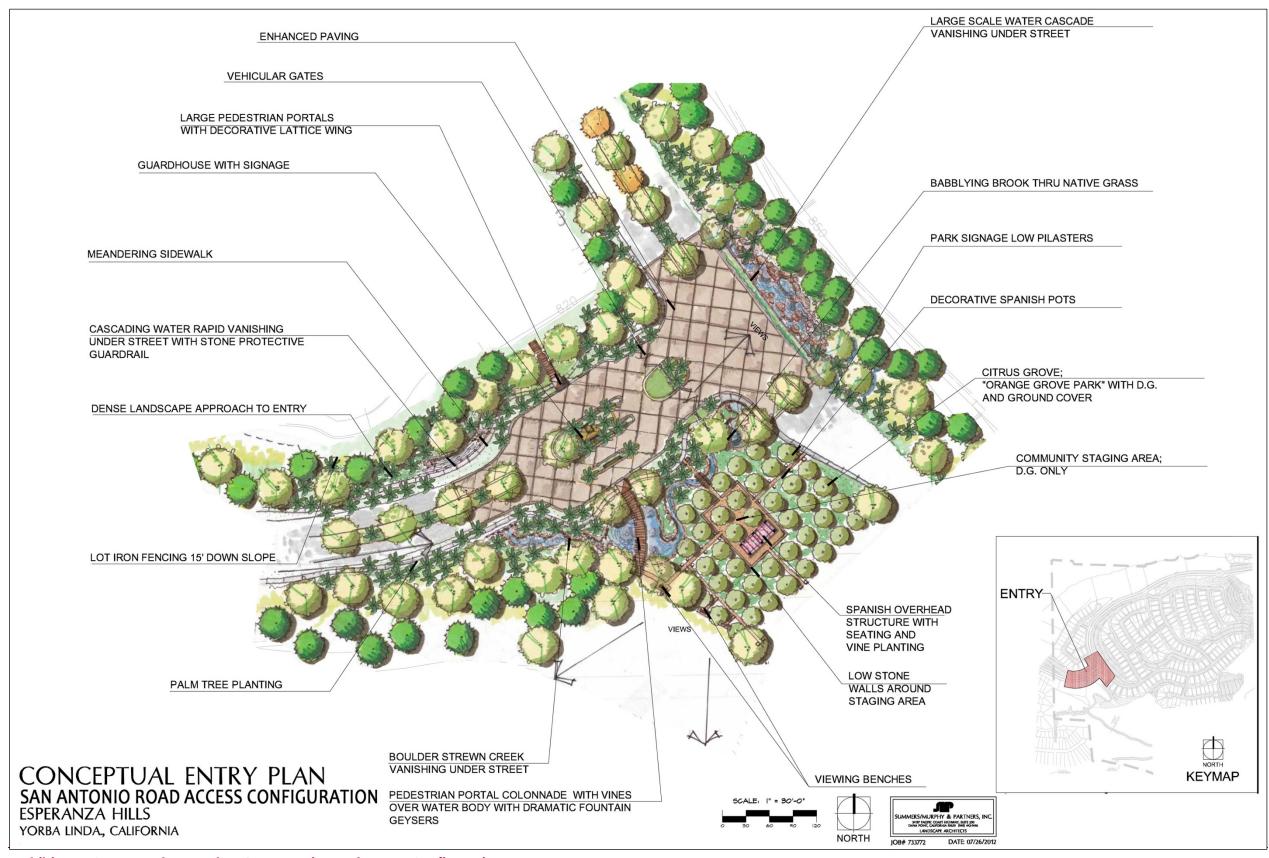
Conceptual Entry Plan, San Antonio Road Access Configuration
